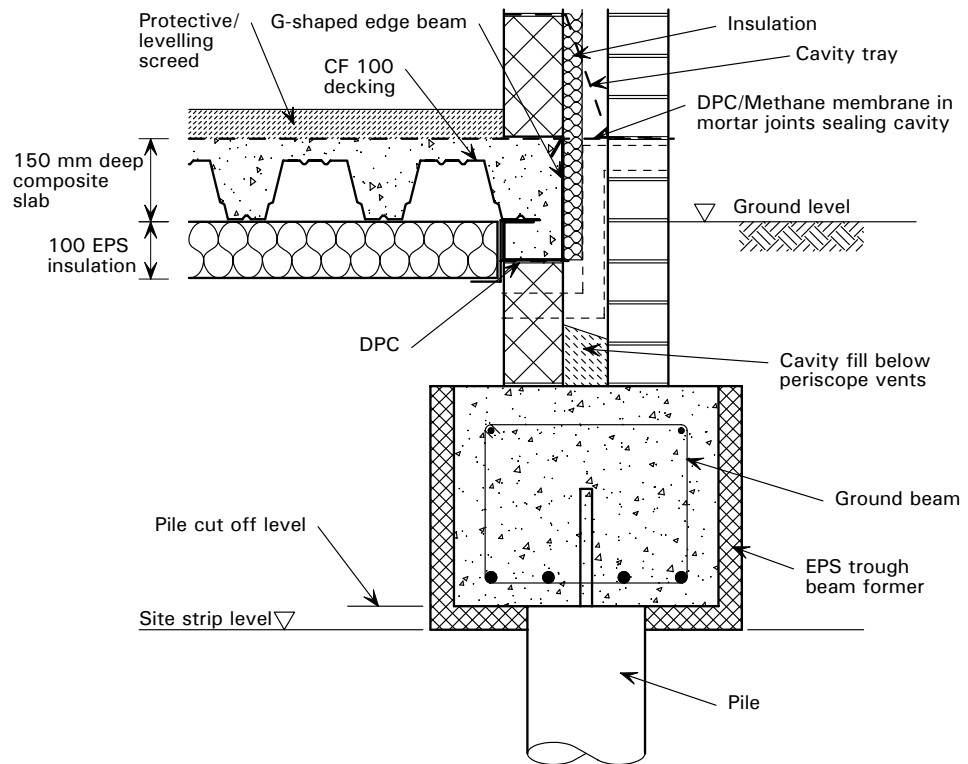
In-situ concrete ground beam eliminating pile caps with G-shaped edge beam for composite floor on 'brownfield' site.
